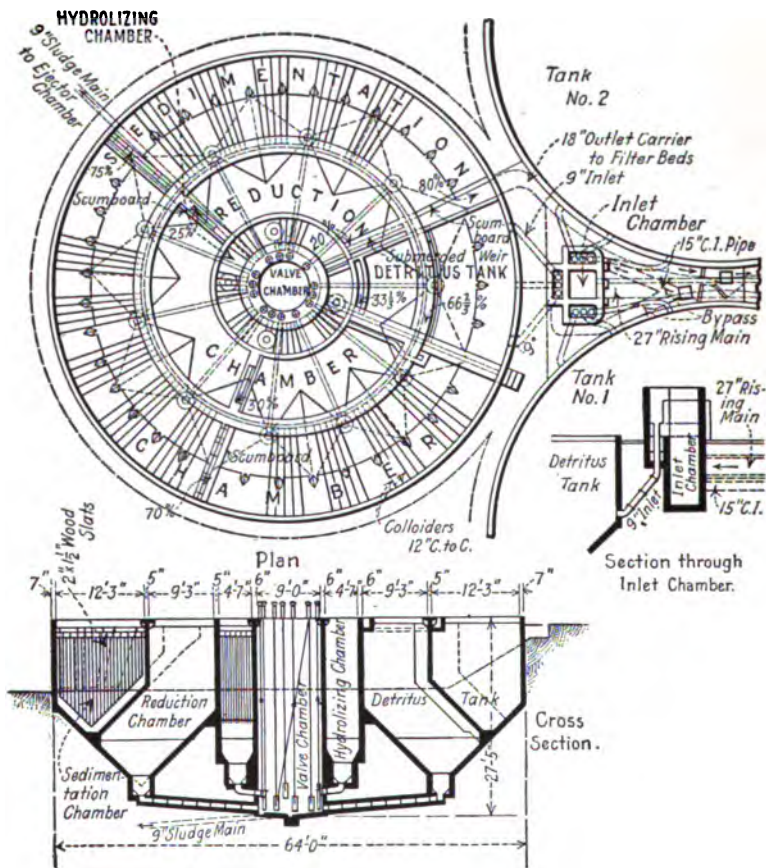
Plan and Section of Hydrolytic Tank at Luton, England.
